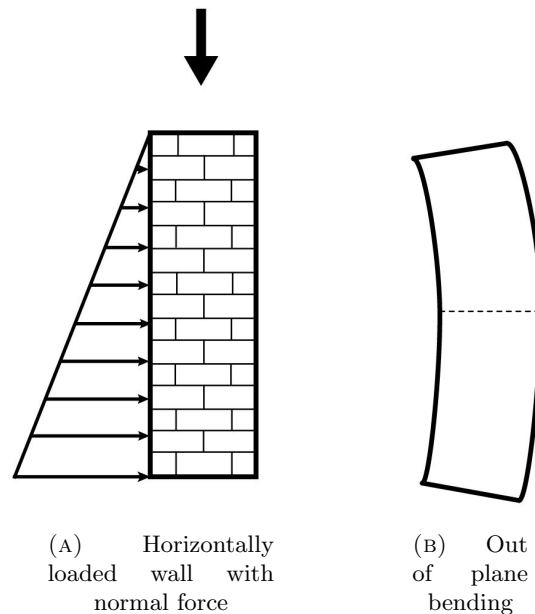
Masonry wall under triangular horizontal load and normal force
